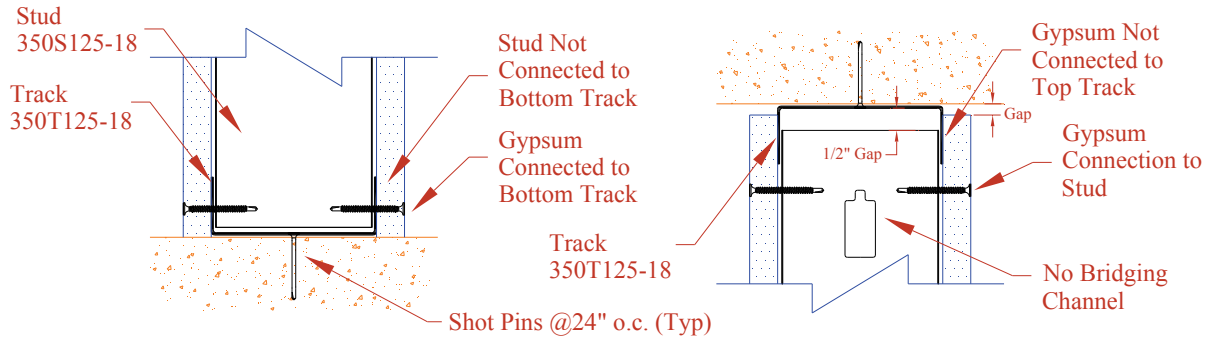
Geometry of Typical Gypsum Partition Wall Specimens
